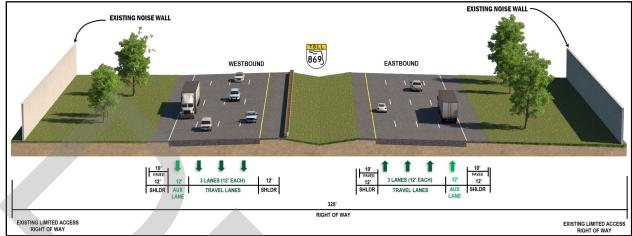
(b) - Existing Roadway Section of SR 869 between US 441 and Lyons Road
